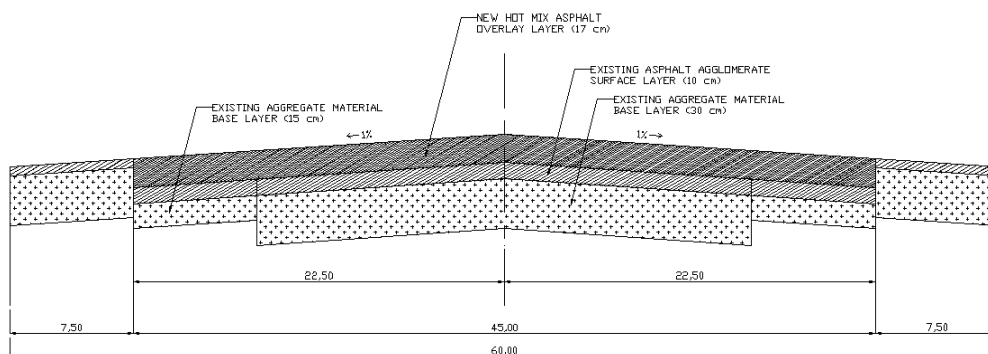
Existing Runway Final Configuration, Alternative 1.
